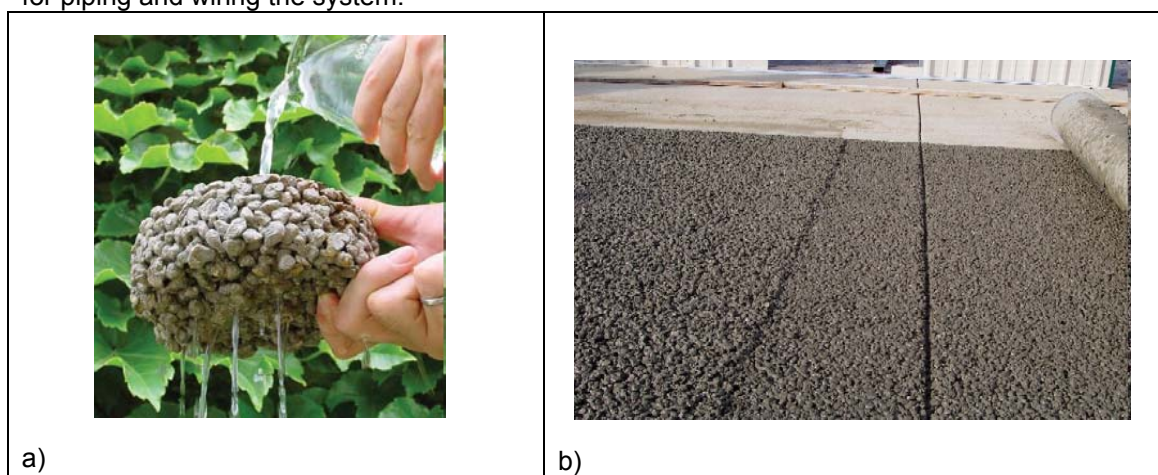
Detail a) of a piece of porous concrete floor and b) of the layout of this material in the greenhouse soil, previous to its construction.
